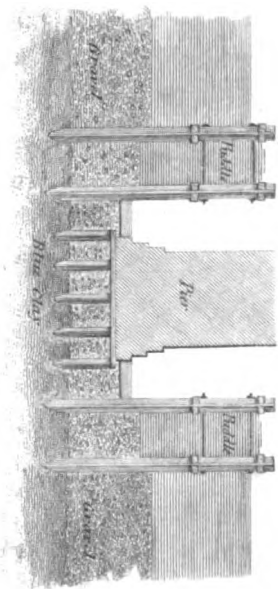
COFFERDAM used for building BENDLEY BRIDGE.
